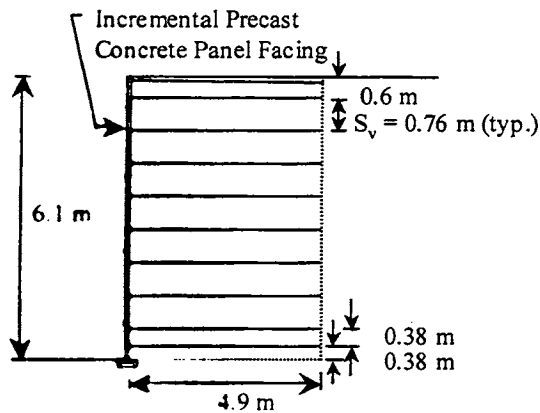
CLA steel strip test wall (adapted from Richardson, et. al., 1977).
